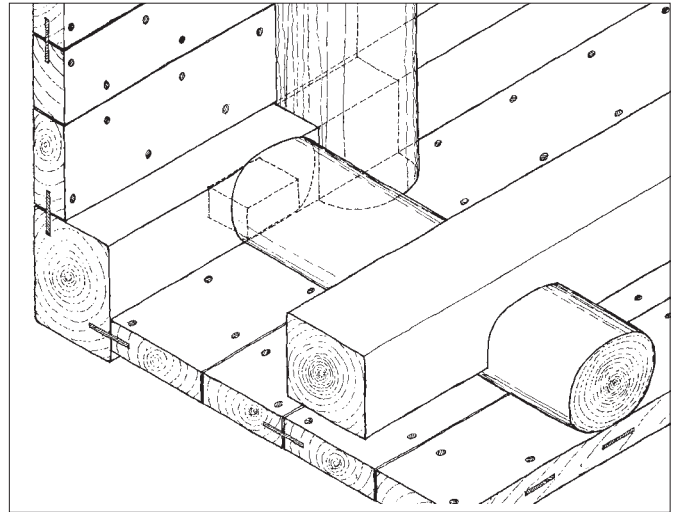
Detail of Area K caisson, junction of chine with side wall and flooring (C. J. Brandon).
